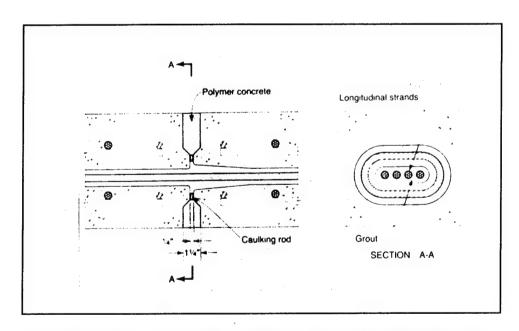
Typical segment joint, Woodrow Wilson Memorial Bridge (from ASCE 1984)
